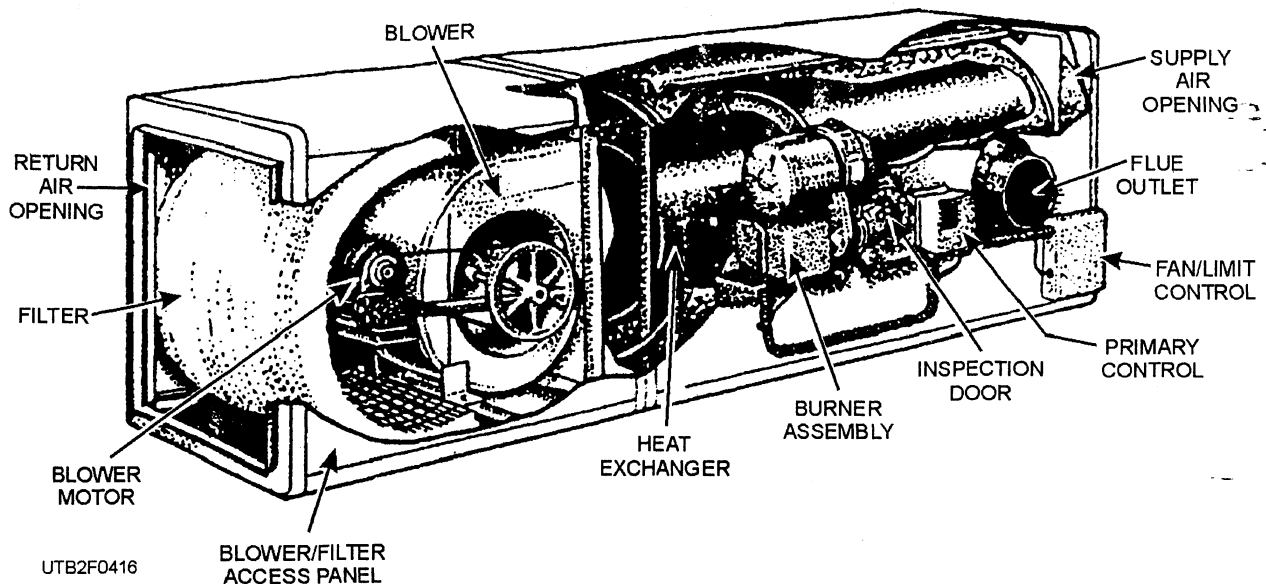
Cutaway view of a horizontal stowaway oil furnace.
